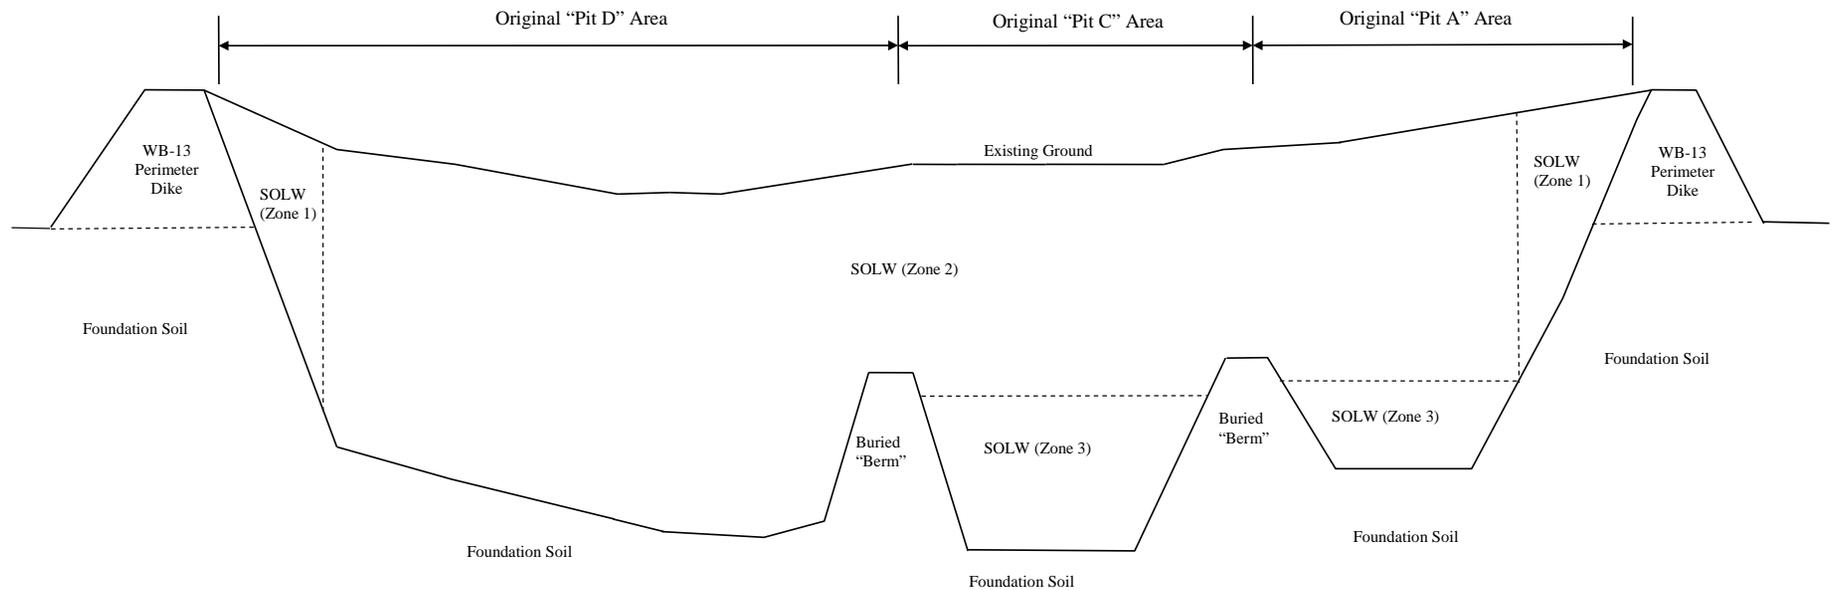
Schematic of Subsurface Profile at Cross Section A-A'
